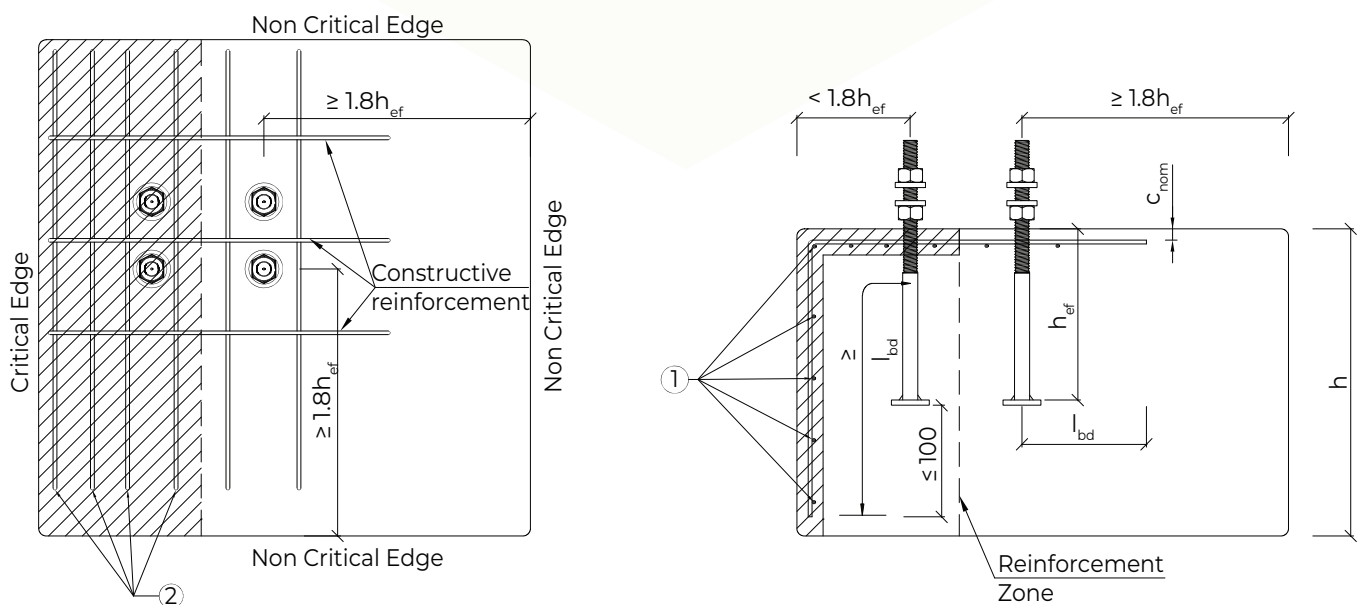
(Concrete Splitting Reinforcement for EBB-S)
